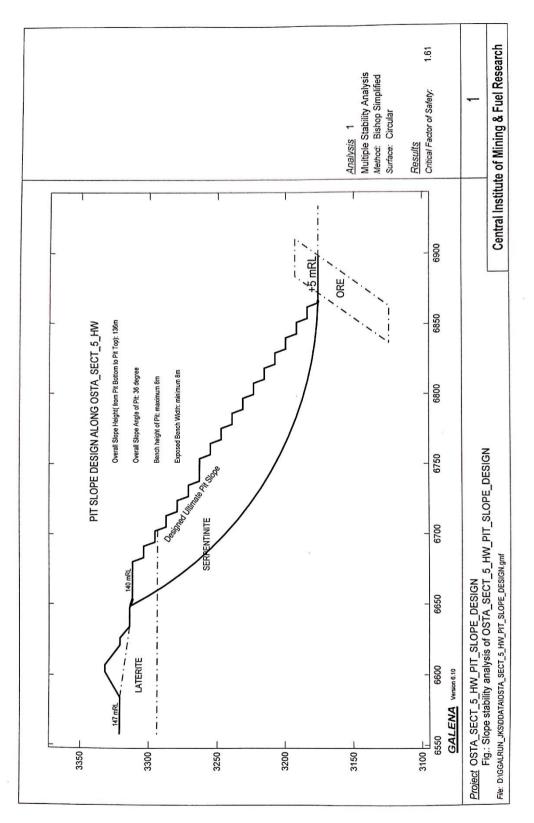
Design of Ultimate Hangwall Pit along Section Sect-5
